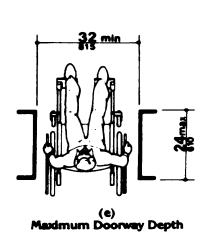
Accessible Route Width Reduction UFAS and FHA Dwelling Units
